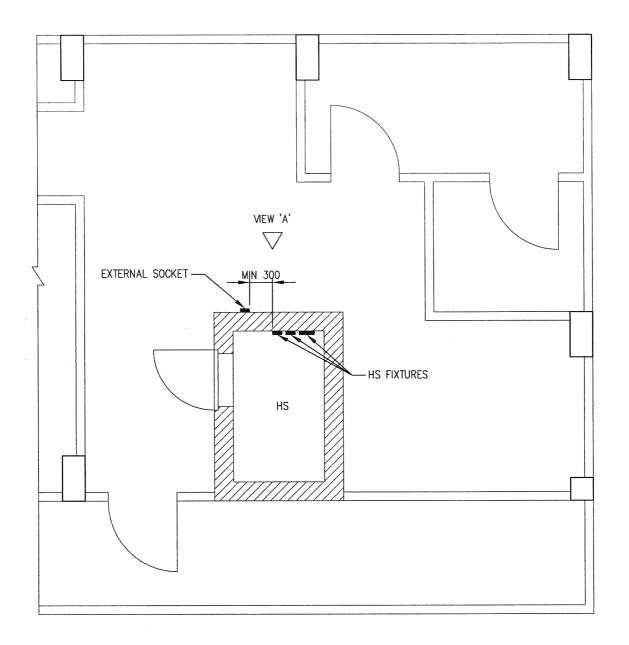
(r) PLAN OF HS WALLS WITH PRECAST HS
